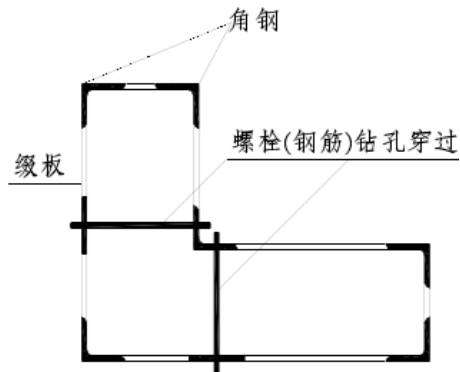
The schematic diagram of cladding steel reinforces special-shaped column
